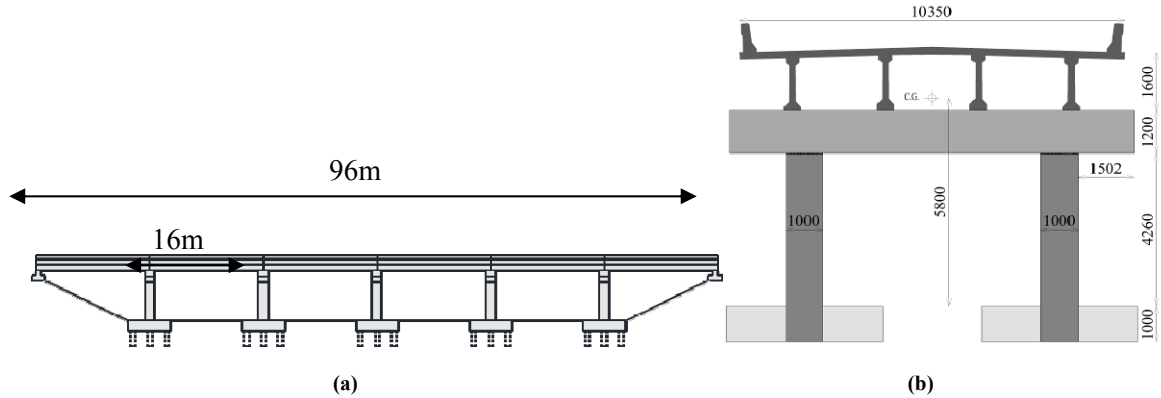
Prototype bridge: (a) longitudinal profile (b) transverse section
